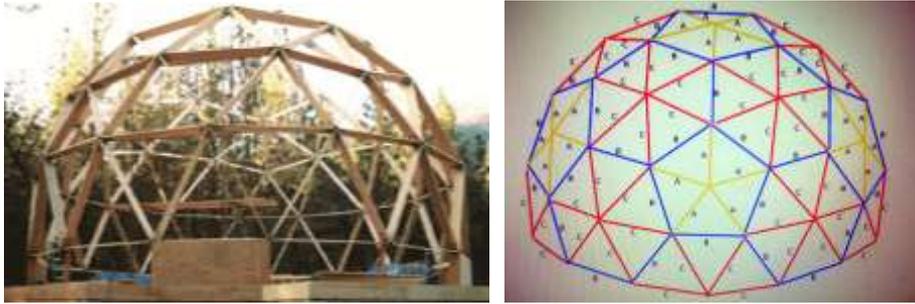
Geodesic dome used in the construction of a green house in mashhad, Iran.
